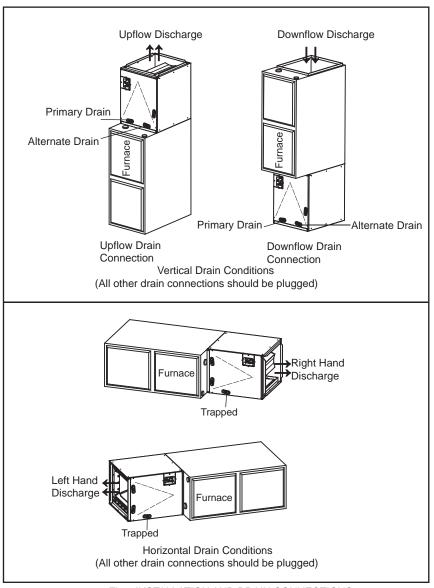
INSTALLATION AND DRAIN CONNECTIONS
